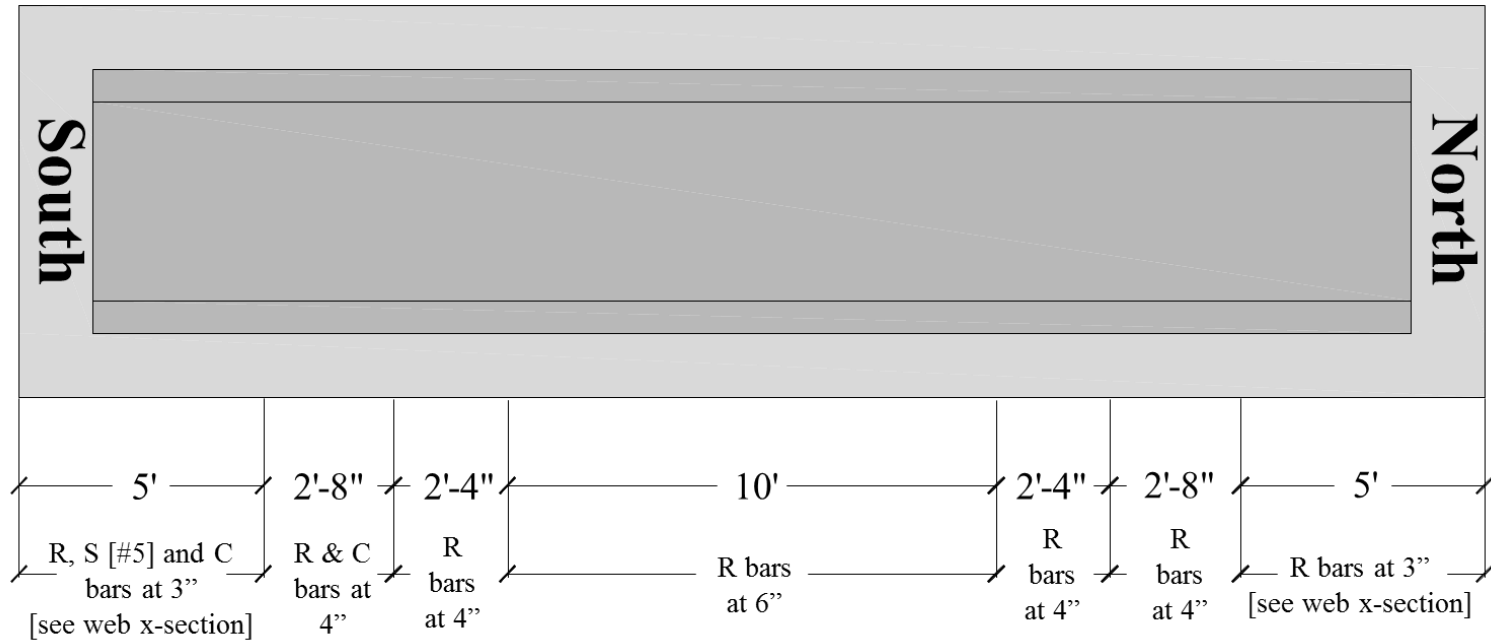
Beam 4 rebar layout (*note lack of symmetry in reinforcement layout)
